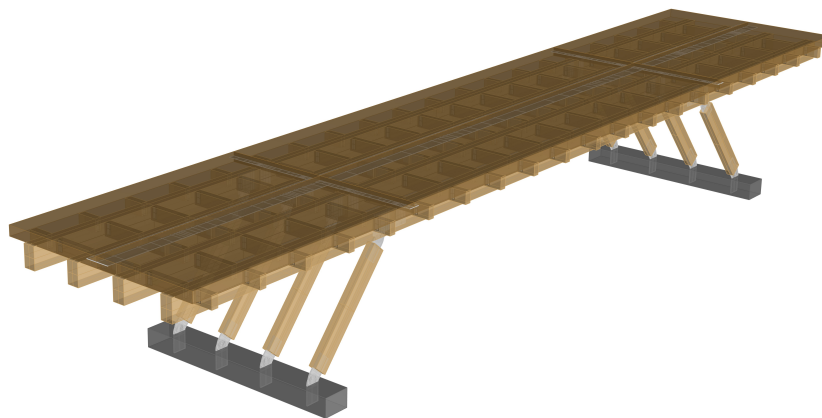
Best suited typology: strut frame with integrated cross girders
